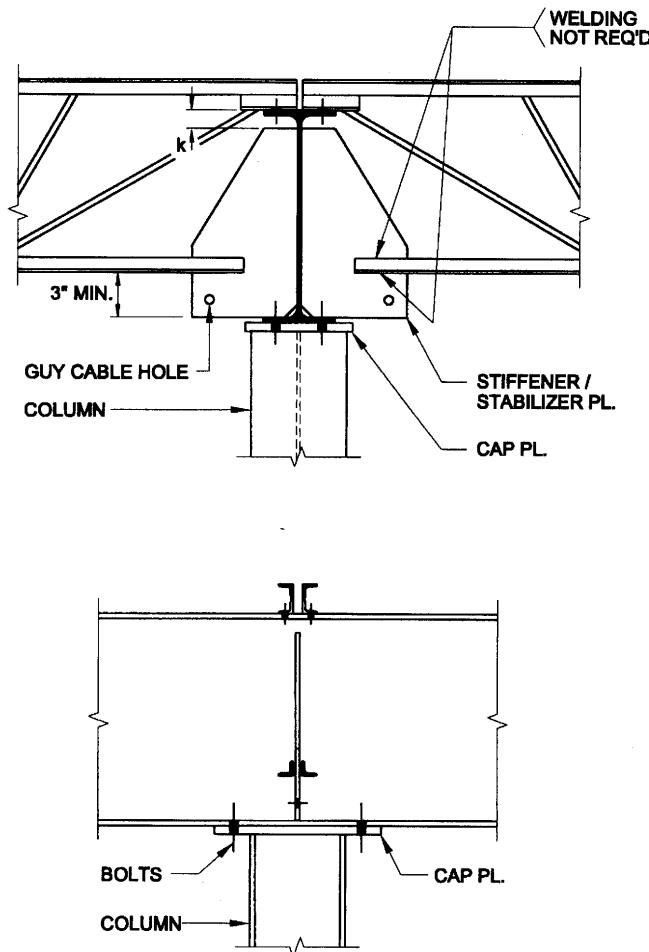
Beam framing continuously over column top, stability provided with stiffener plates, joist-chord extensions located above column top not welded.
